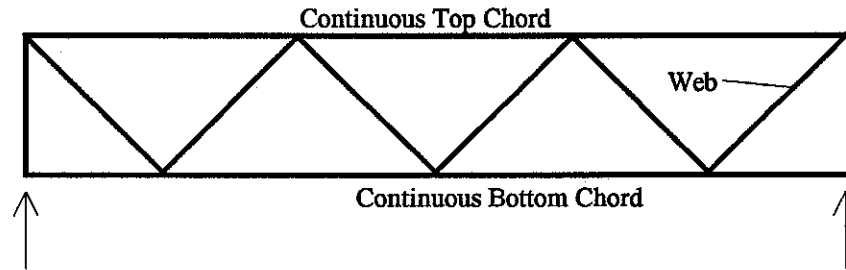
Standard truss with continuous chords and load-carrying joints similar to MPC trusses or steel bar joists.
